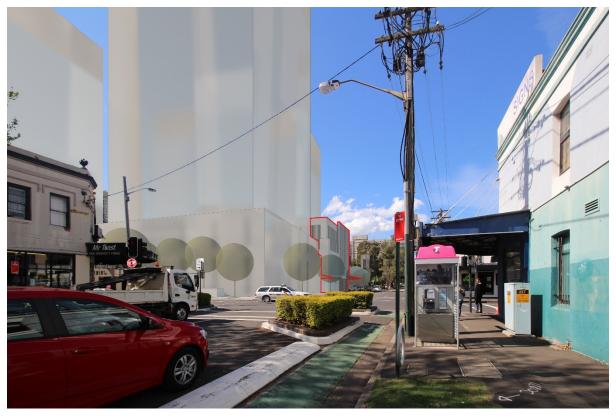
Viewpoint 1 – Proposed view east from Wellington Street
